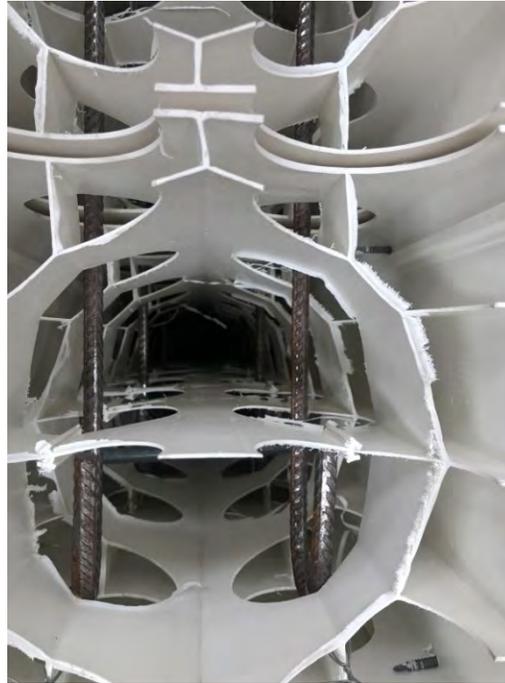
Dintel panels with shear steel reinforcements (before pouring concrete)
